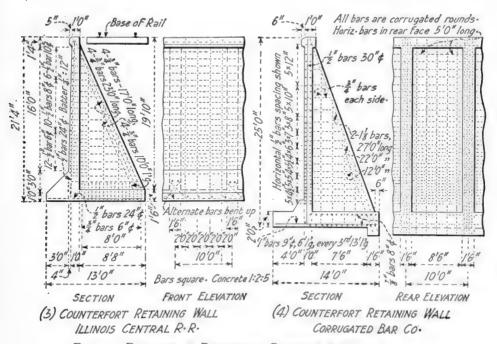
Examples of Reinforced Concrete Retaining Walls.
